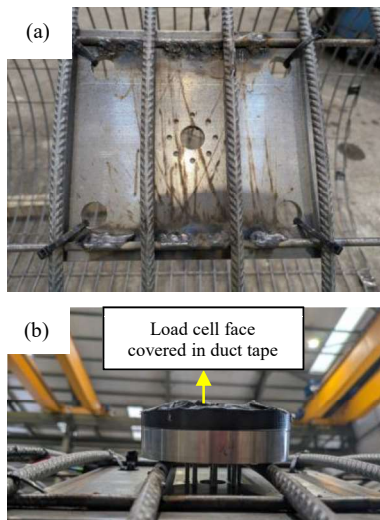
Load cell installation process, (a) steel plate welded to the outer reinforcement cage, and (b) load cells held to the plate by eight bolts.
